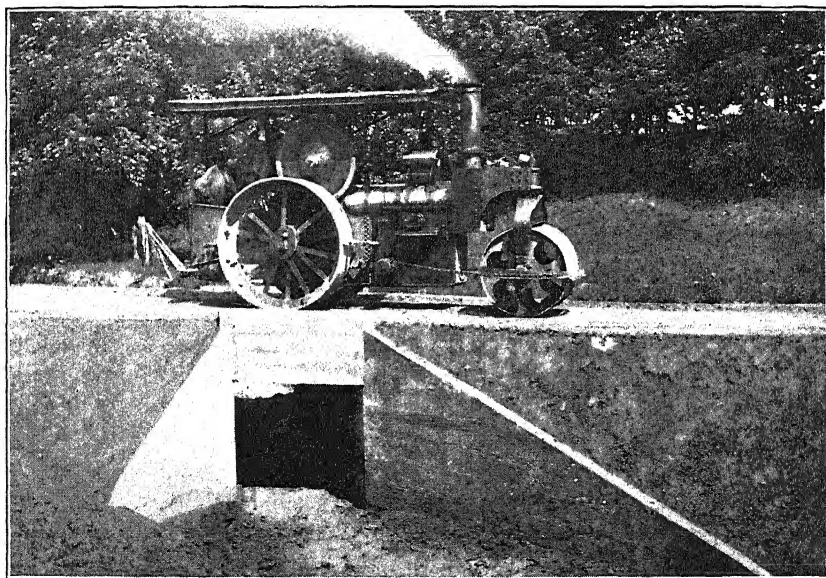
CONCRETE-STEEL CULVERT, 5 FEET SQUARE; 10-TON ROLLER.
